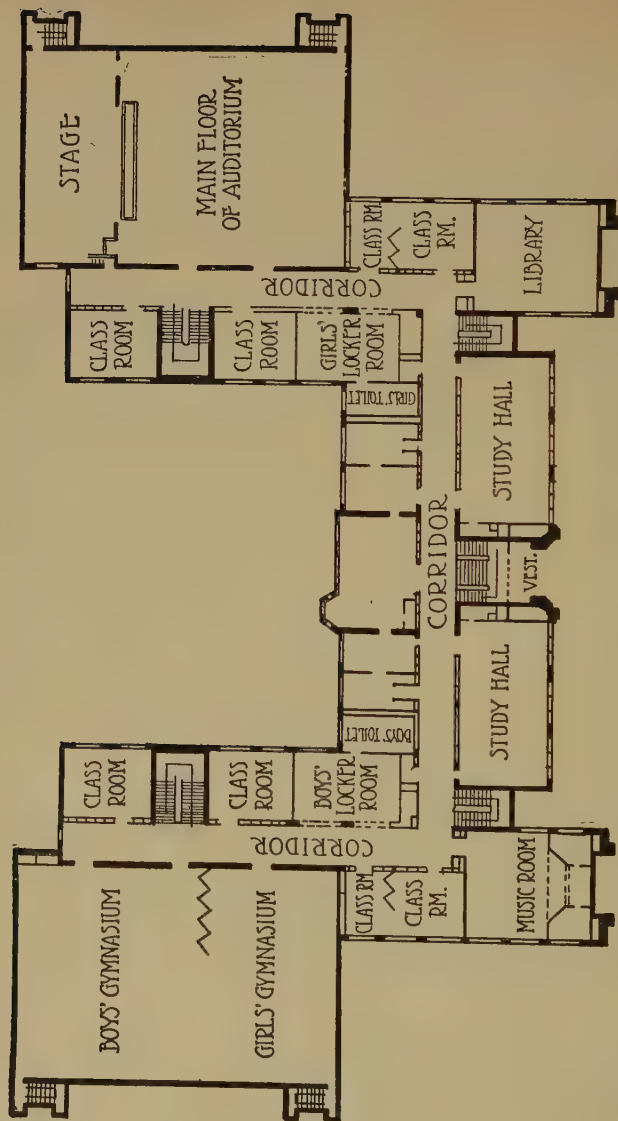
First-floor plan of the senior high school, Dubuque, Iowa
